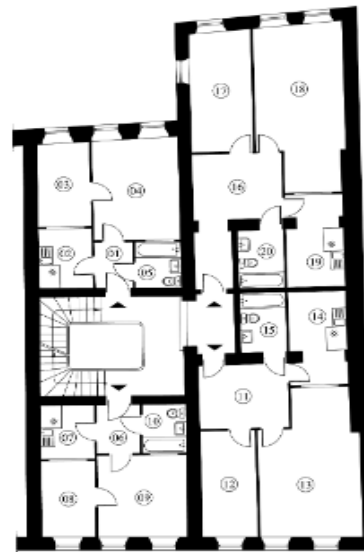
View and layout of a historical tenement house, Piwna street, Old Town, Warsaw
